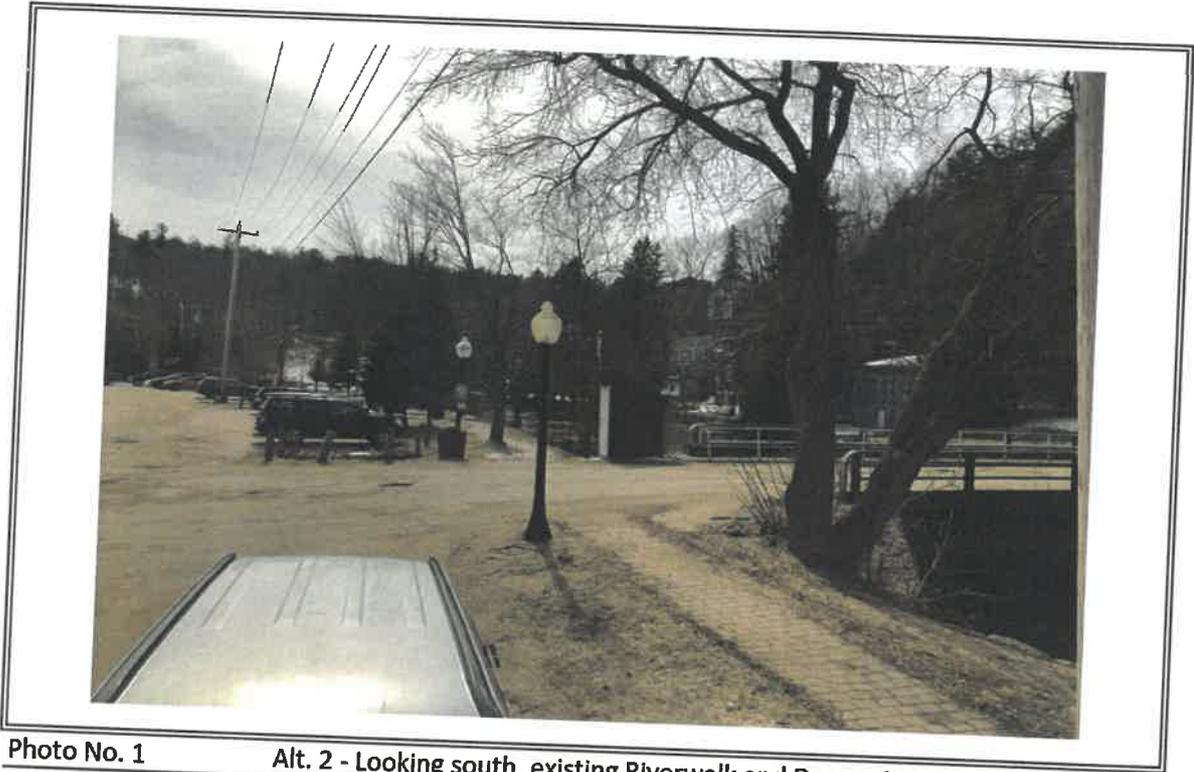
Alt. 2 - Looking south, existing Riverwalk and Dorsey Street bridge
